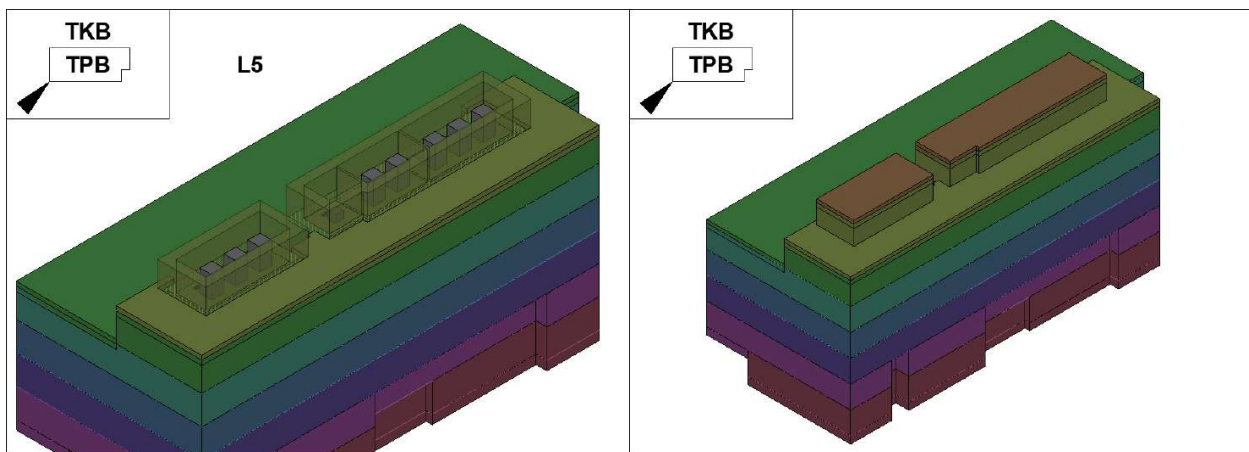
3D view of level L5 and external view of the tritium plant building.
